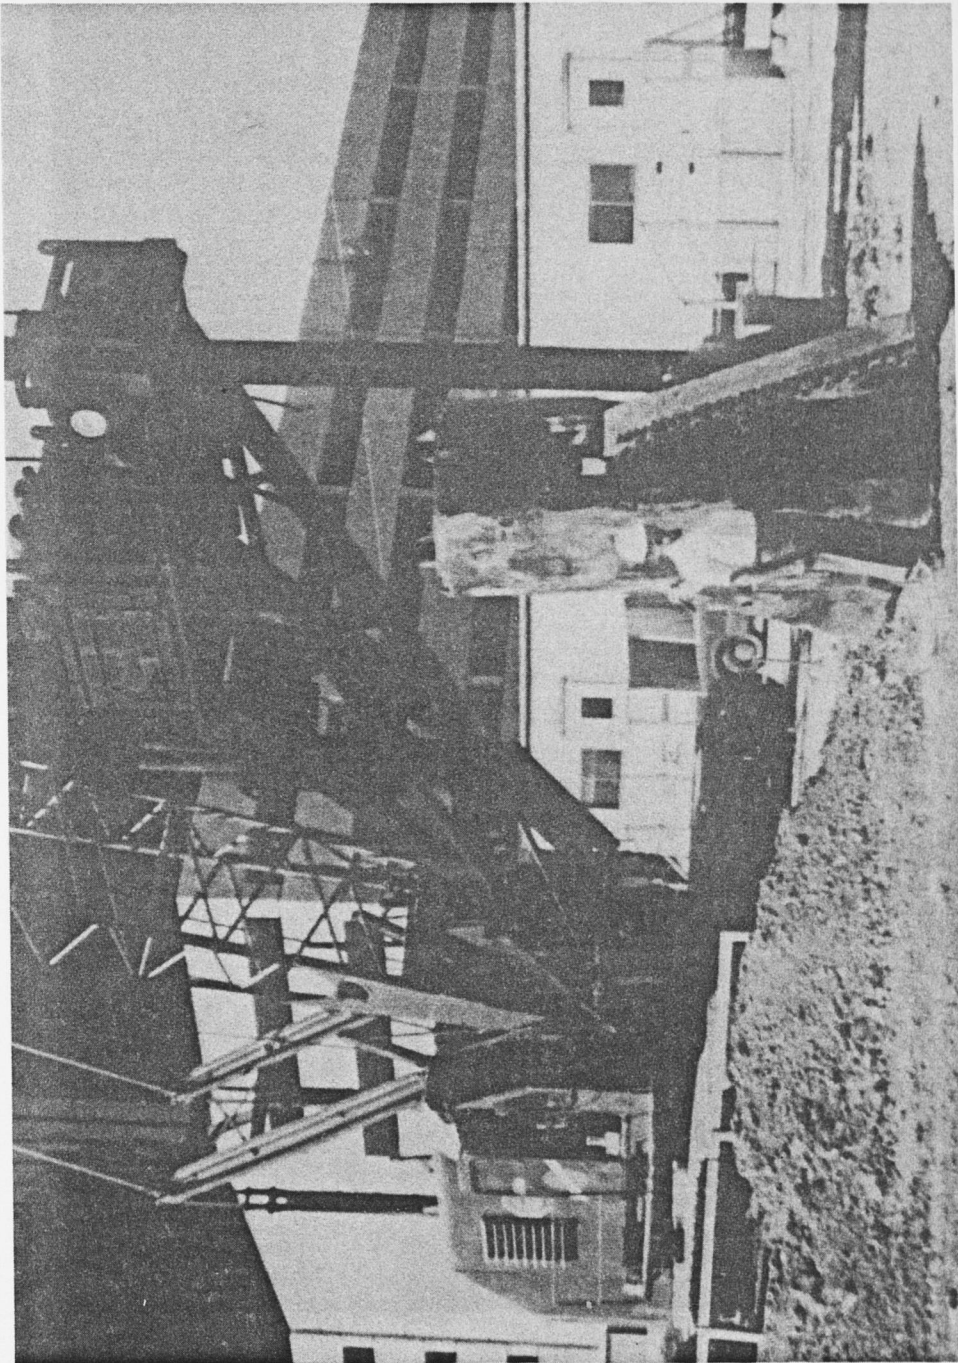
OPEN BELLING TOOL SHOWING RELATIVE SIZE OF BELL CUT
